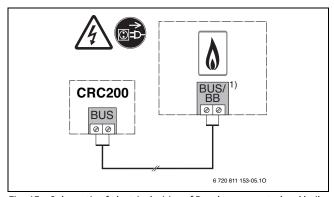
Schematic of electrical wiring of Bosch room control and boiler
